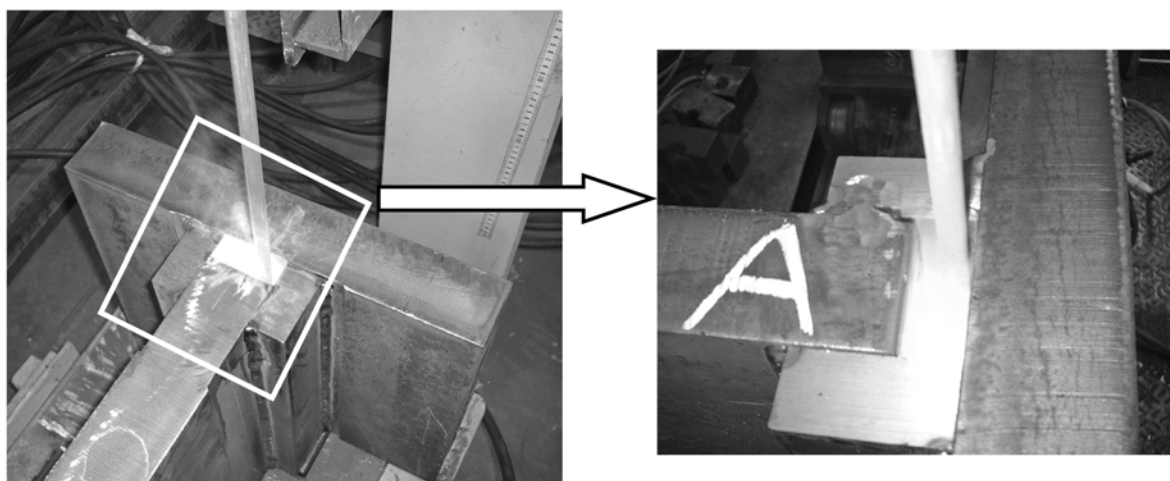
Setup for simulating electroslag welding of the diaphragm to the skin plate of the box column.
